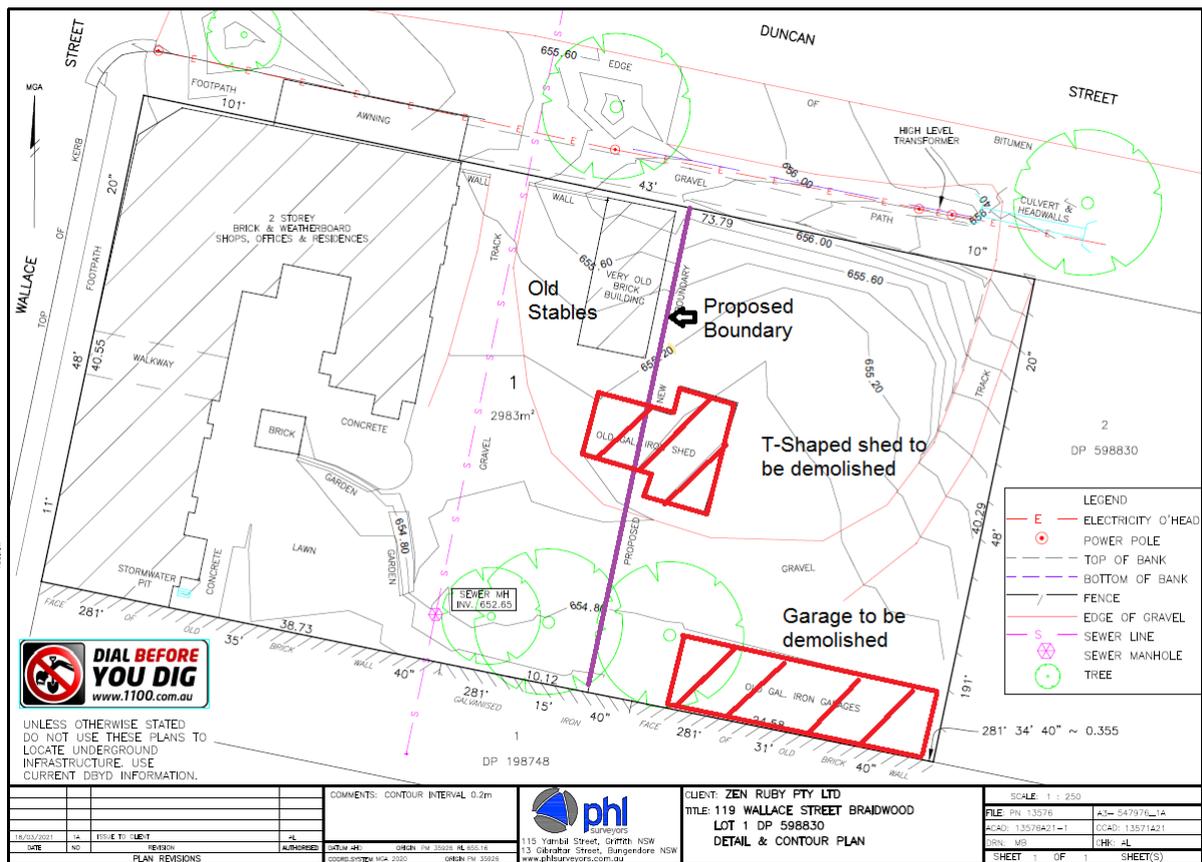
Survey Plan showing proposed subdivision boundary (purple) and existing buildings to be demolished (red)
